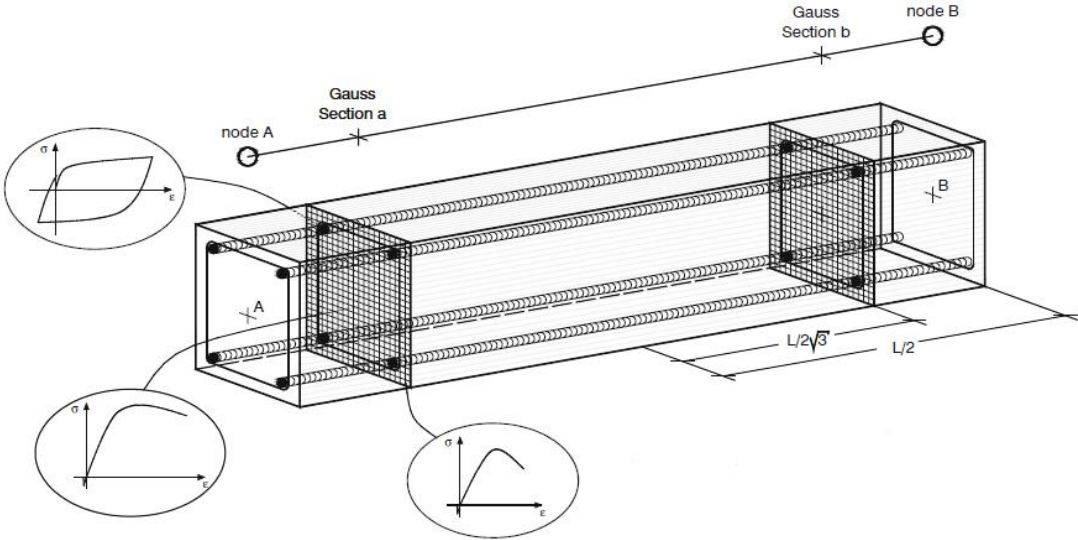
Discretization of a typical reinforced concrete cross-section [67].
